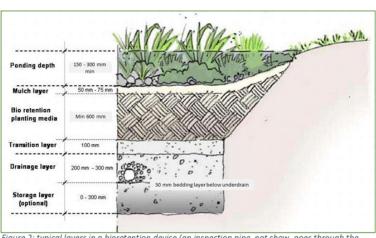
typical layers in a bioretention device (an inspection pipe, not show, goes through the layers and connects into the underdrain)
